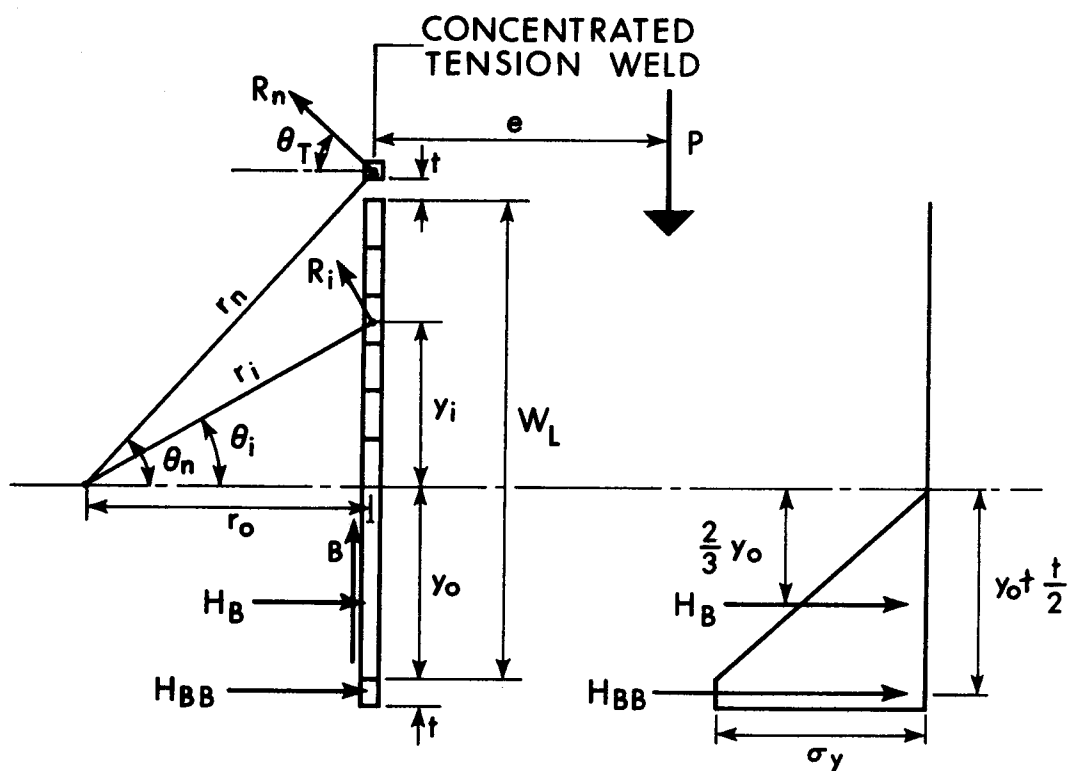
ECCENTRICALLY LOADED TEE-SHAPED FILLET WELD
